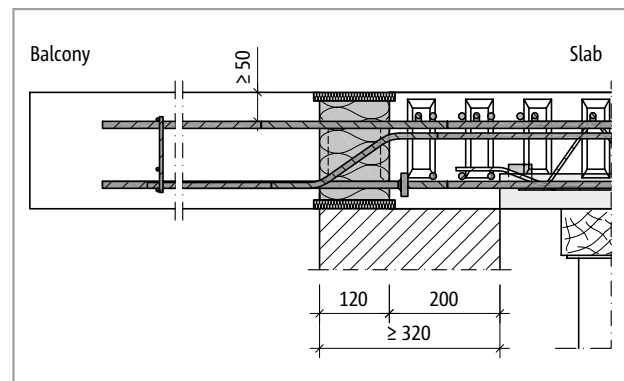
Schöck Isokorb® XT type C: Prefabricated slab with edge support with thermal insulating masonry (section XT type C-R-CV50, view XT type C-L-CV35)
